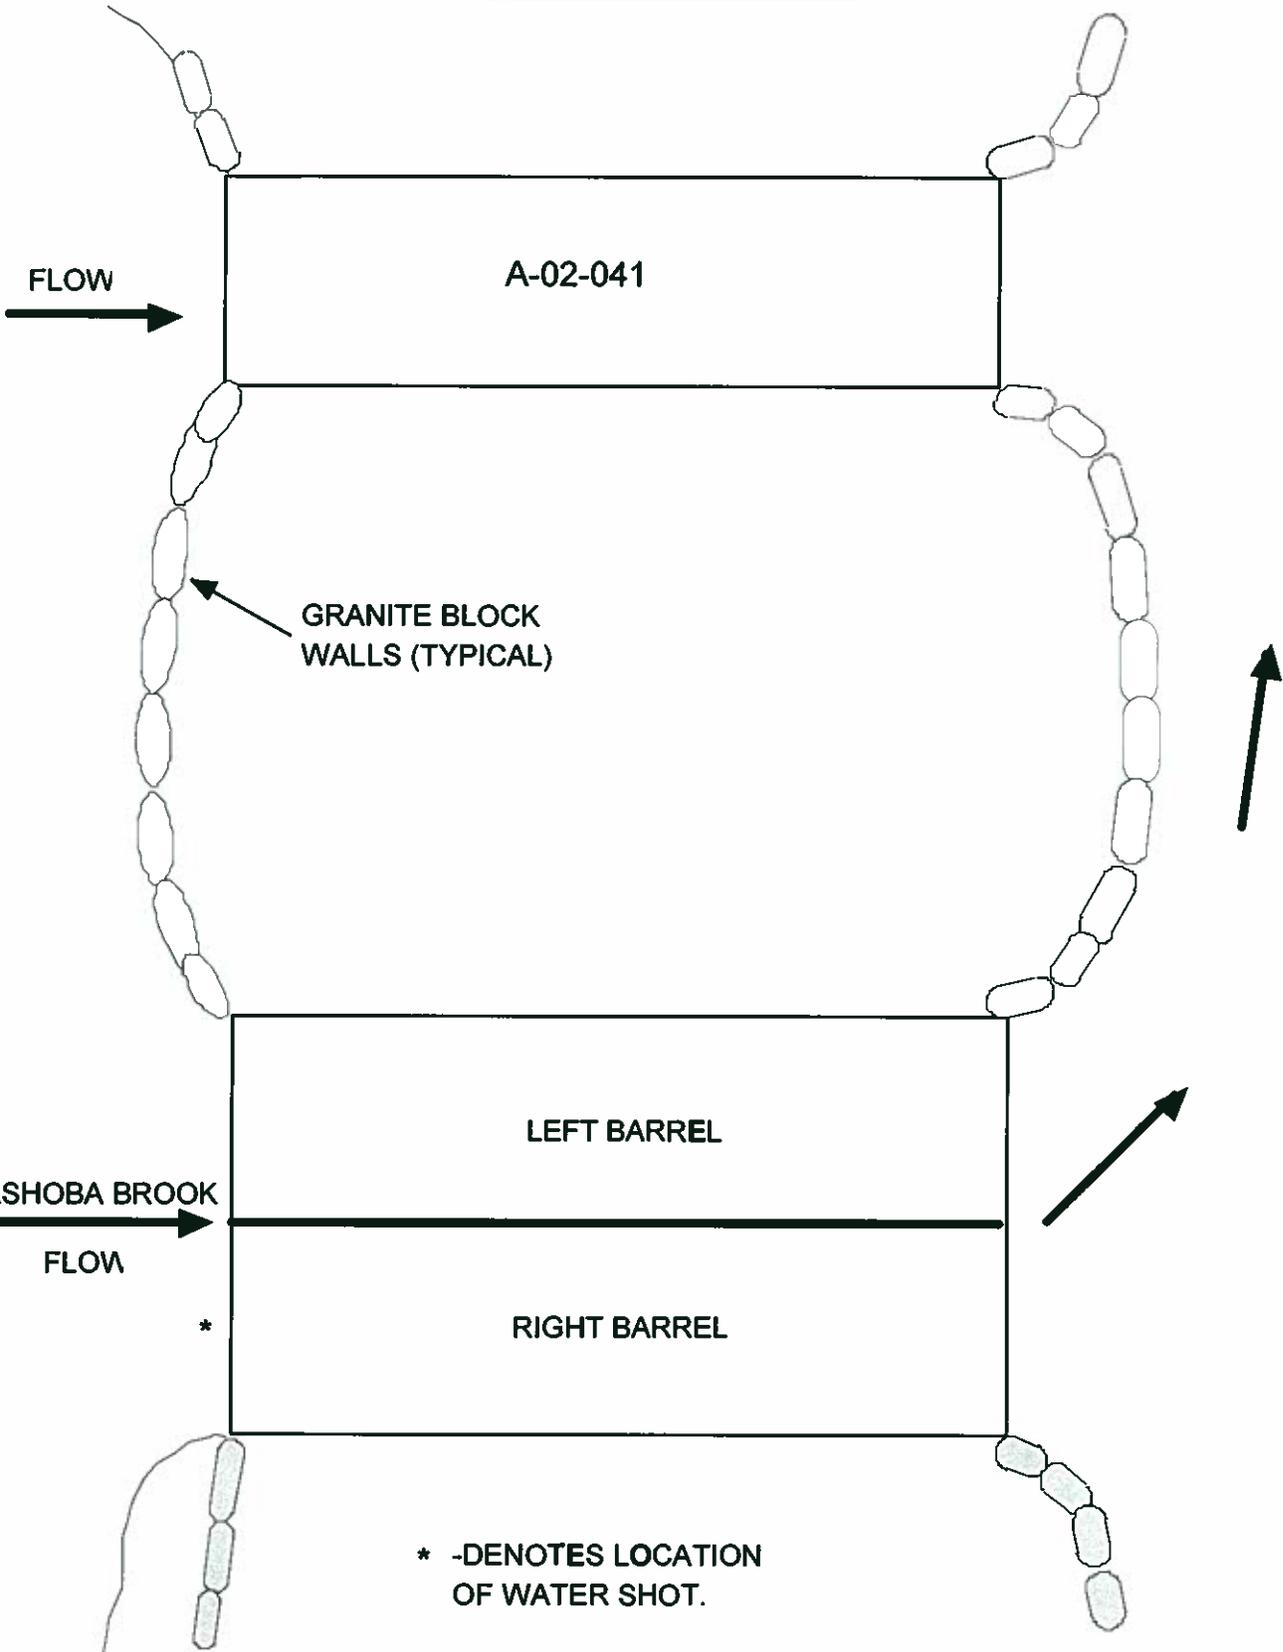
PLAN VIEW (NOT TO SCALE)
